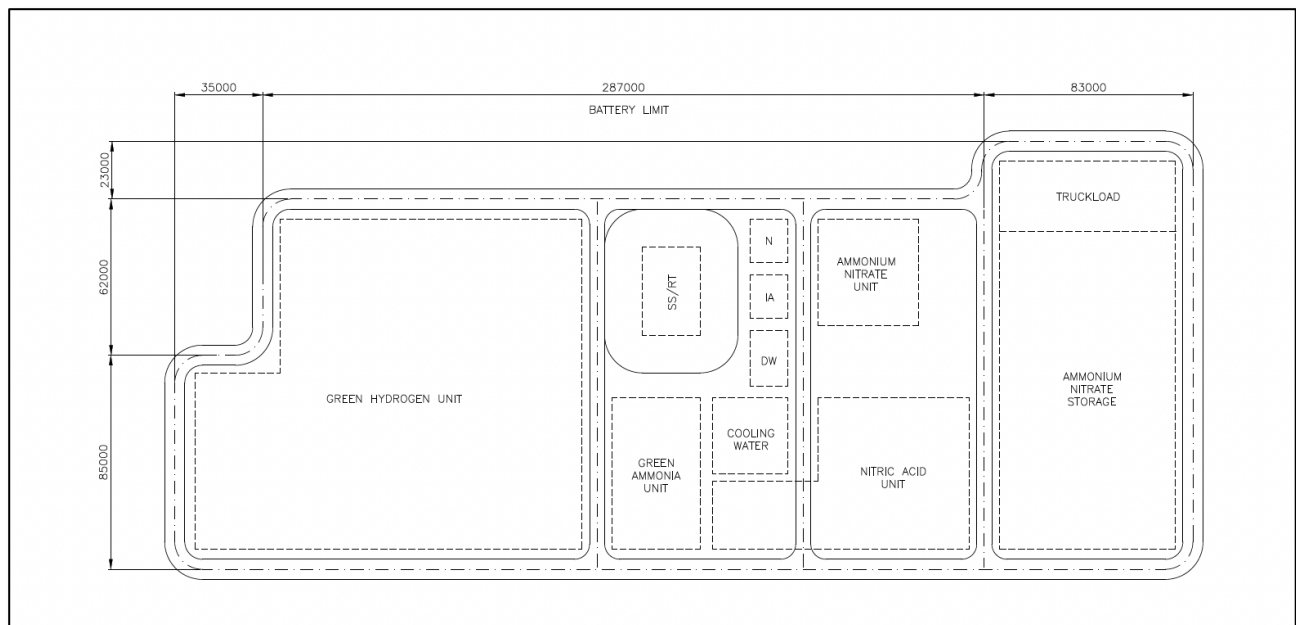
Capanda Green Ammonia Plant, proposed layout .
